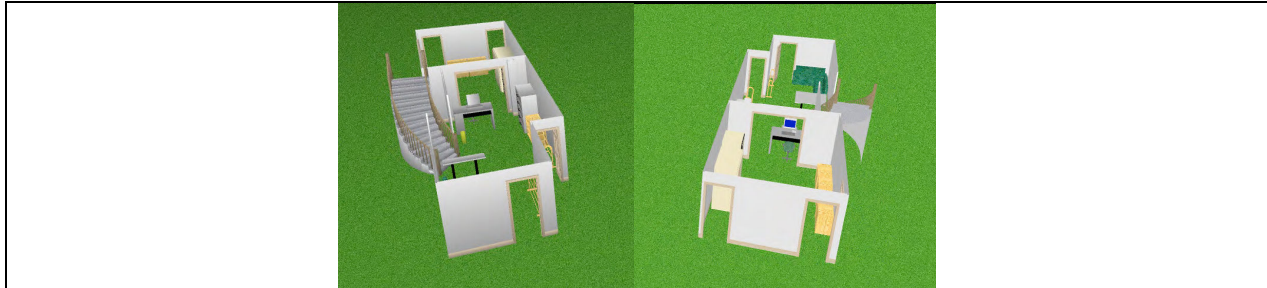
Redesign of Ford Hall Food Pantry project in civil/architectural designs genre. (left) Proposed layout view from front. (right) Proposed layout view from rear.
